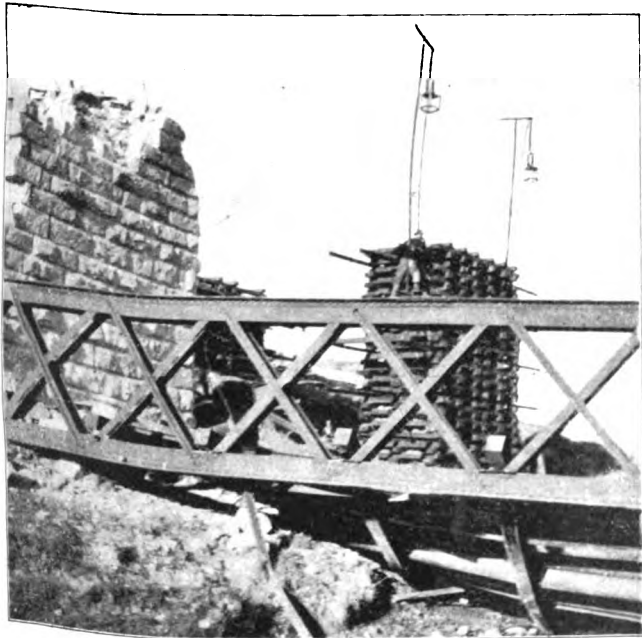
Rhenoster Bridge, showing Girder $\frac{1}{2}$ down, and Arc-lighting.
